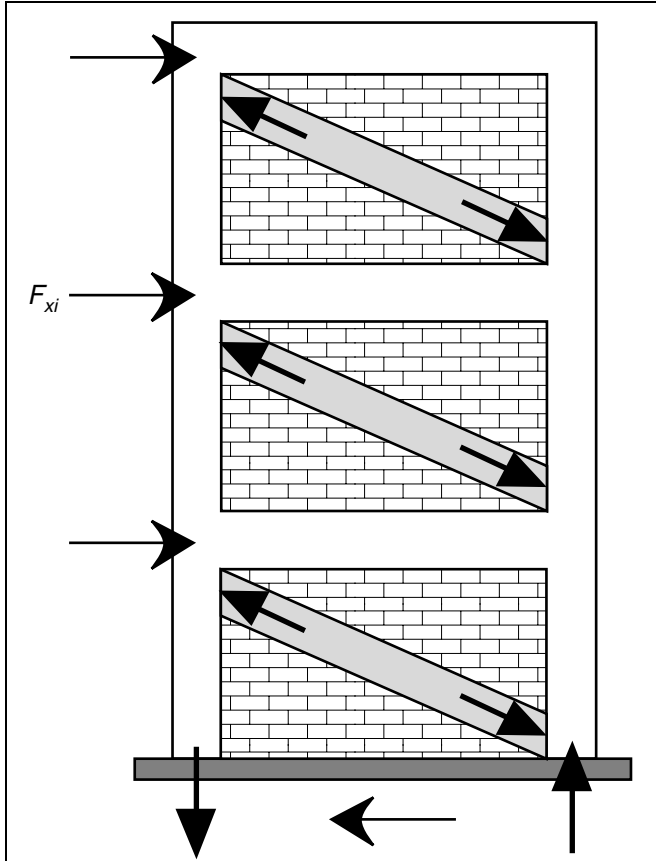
Compression Strut Analogy—Eccentric Struts
